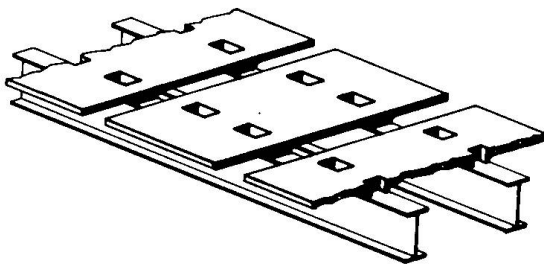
Precast slab elements on a steel structure made of two I-shaped beams
